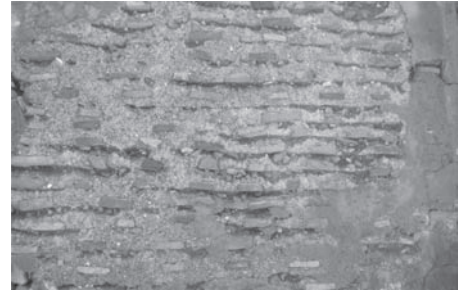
Bath wall built with alternating brick and mortar in Tènès. (Alliche. S., 2011).
